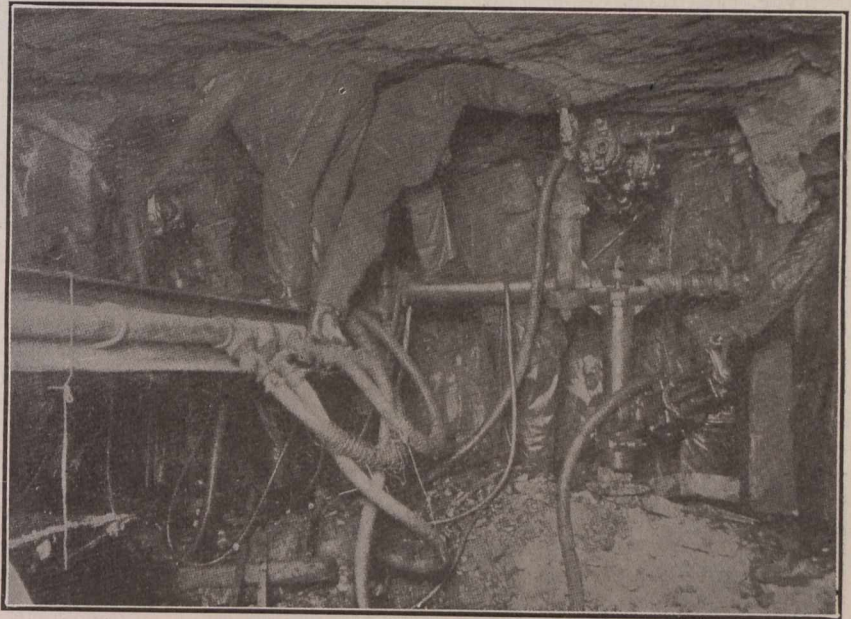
Heading Excavation Using Muck Handling Drill Carriage.
